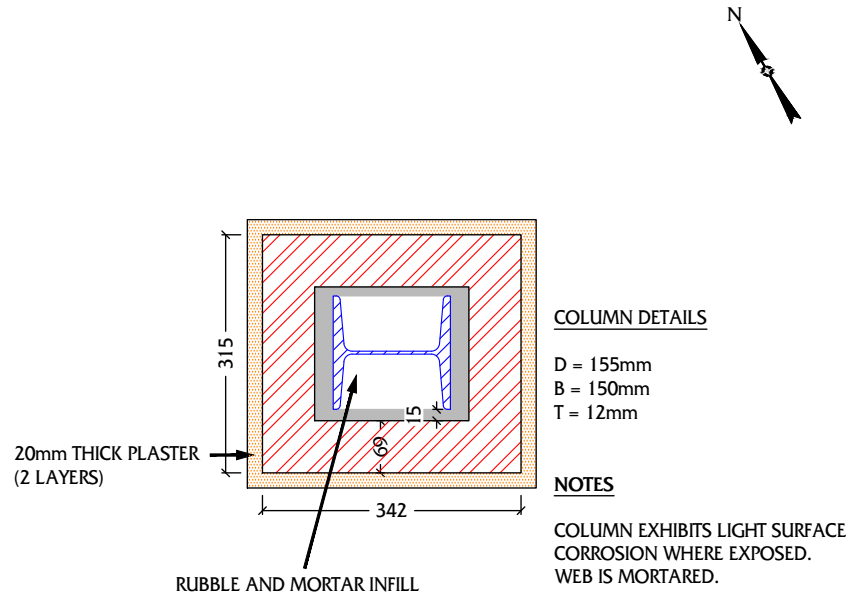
PART PLAN SHOWING DETAILS OF COLUMN Q11 SCALE 1:10
